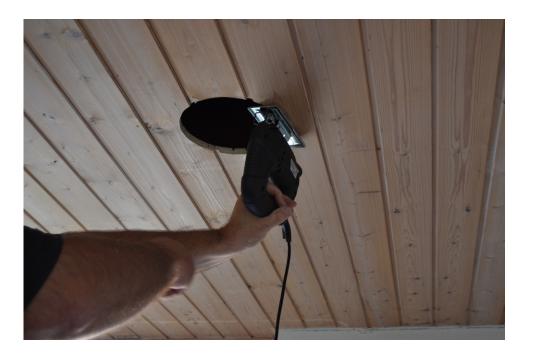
Adjust the cut and check with the template if the hole is lined in size.
